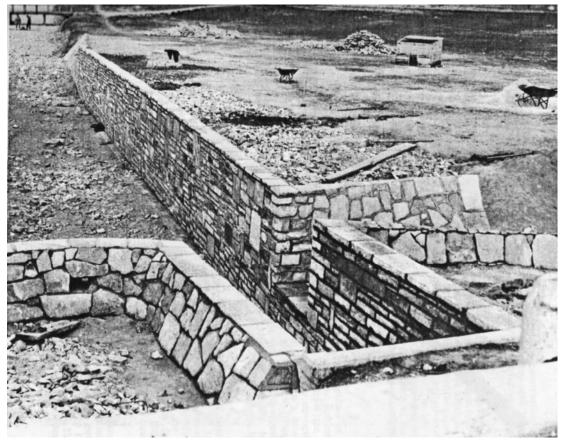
Stone culvert and ditch near Nebraska and Minnesota Avenues under construction by POWs at Fort Leonard Wood, 1943 (U.S. Army Signal Corps photo in Bartholomew & Associates, 29).
